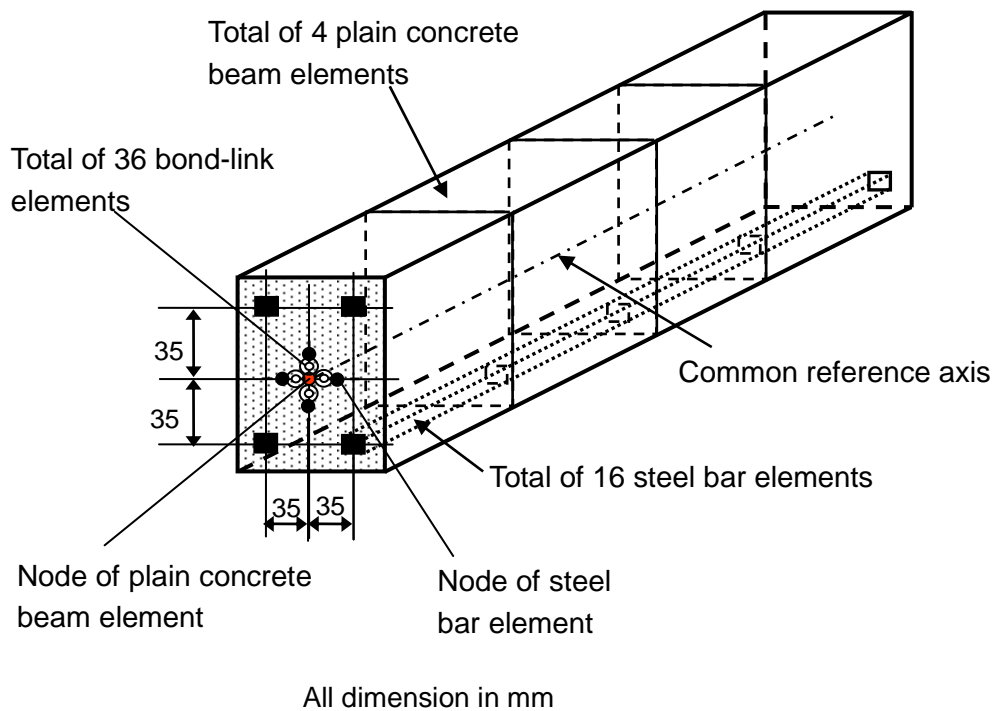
Finite element mesh for simply supported reinforced concrete beam.
